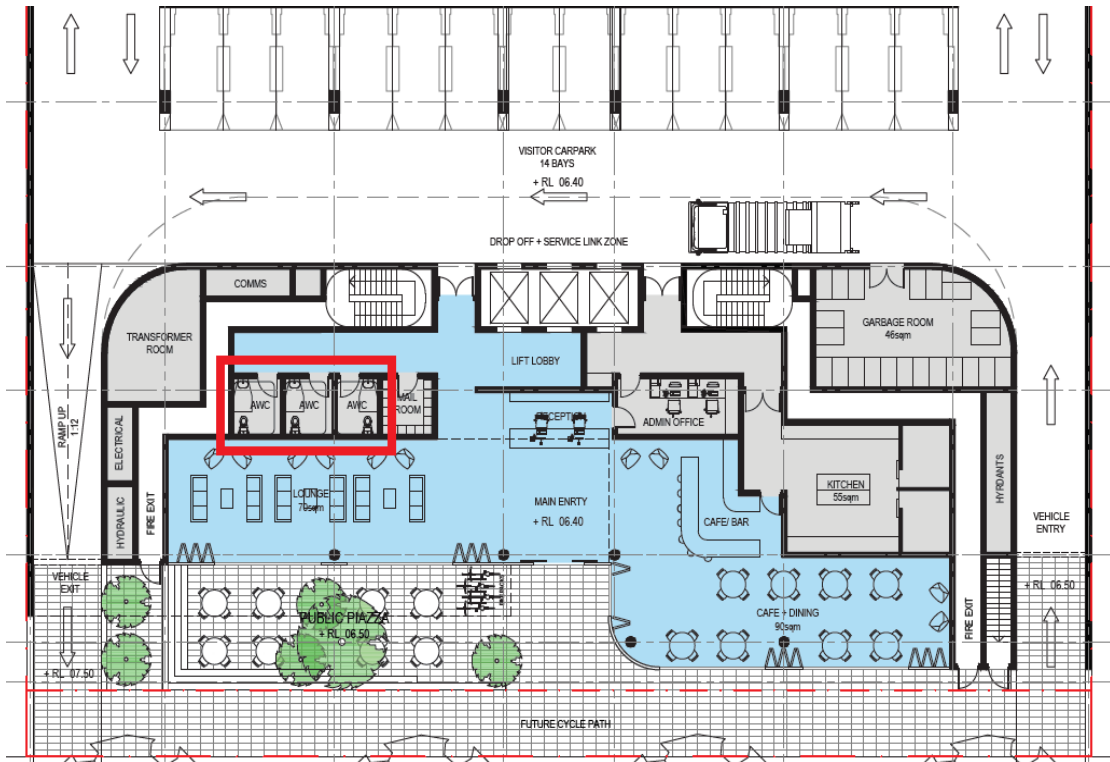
Ground floor plan presented at April Canning Bridge Design Review Panel Meeting with the public end of trip facilities marked in red
